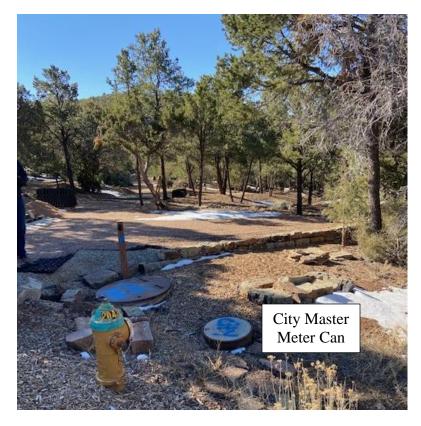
Hyde Park Estates and City of Santa Fe Water Connection
